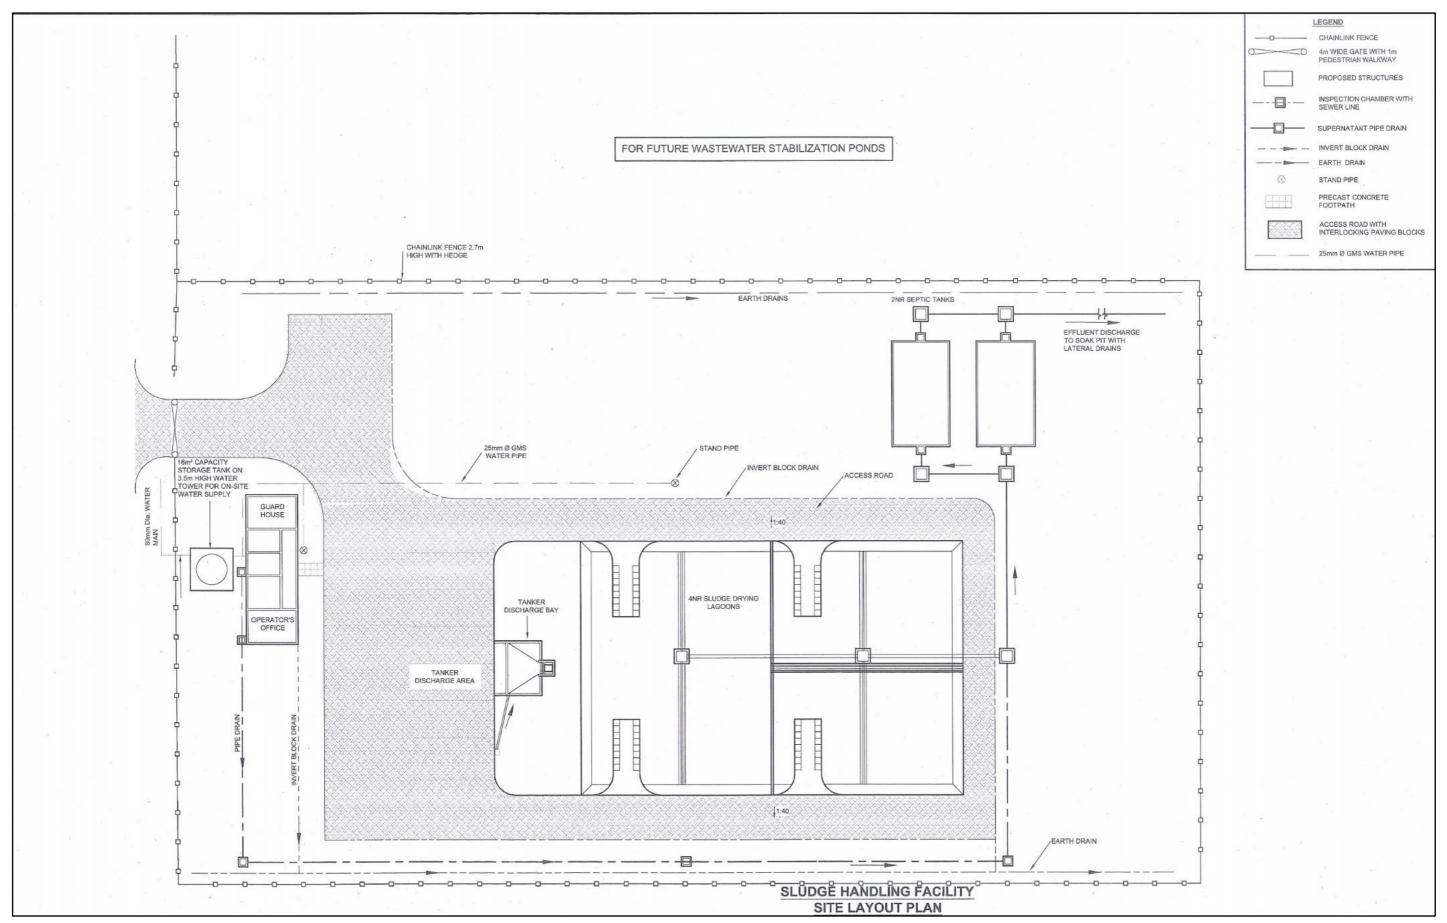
Schematic Layout Plan of the Proposed Sludge Handling Facility
